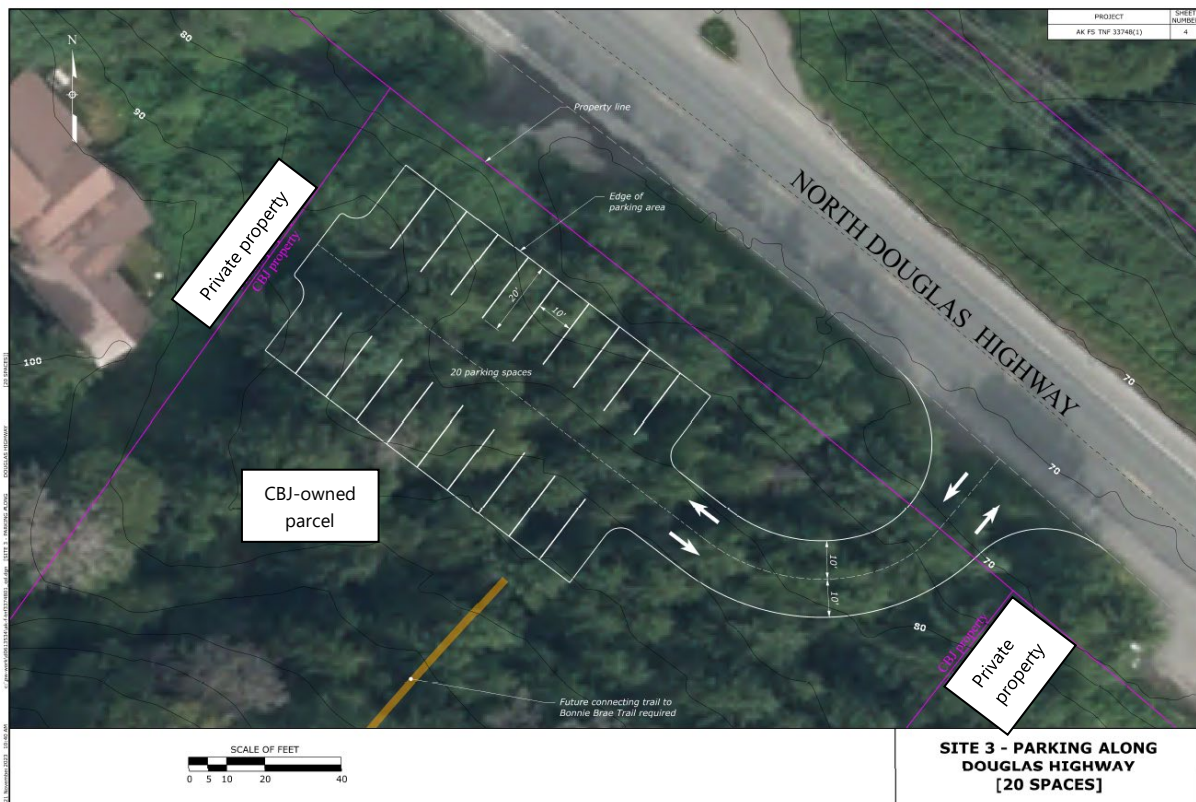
Proposed conceptual site design for Site 3 with long driveway, large parking area with two-way drive aisle and 20 vehicle parking spaces off of North Douglas Highway.
